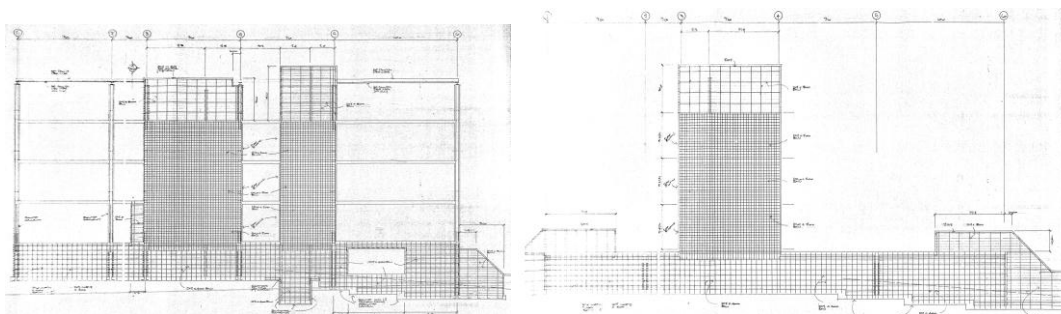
Showing the concrete structural walls that resist building lateral forces.
